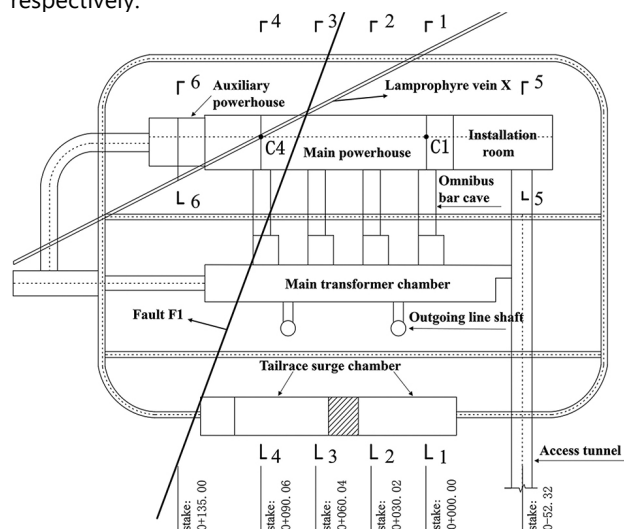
Monitoring sections of the underground powerhouse in the Shuangjiangkou hydropower station
